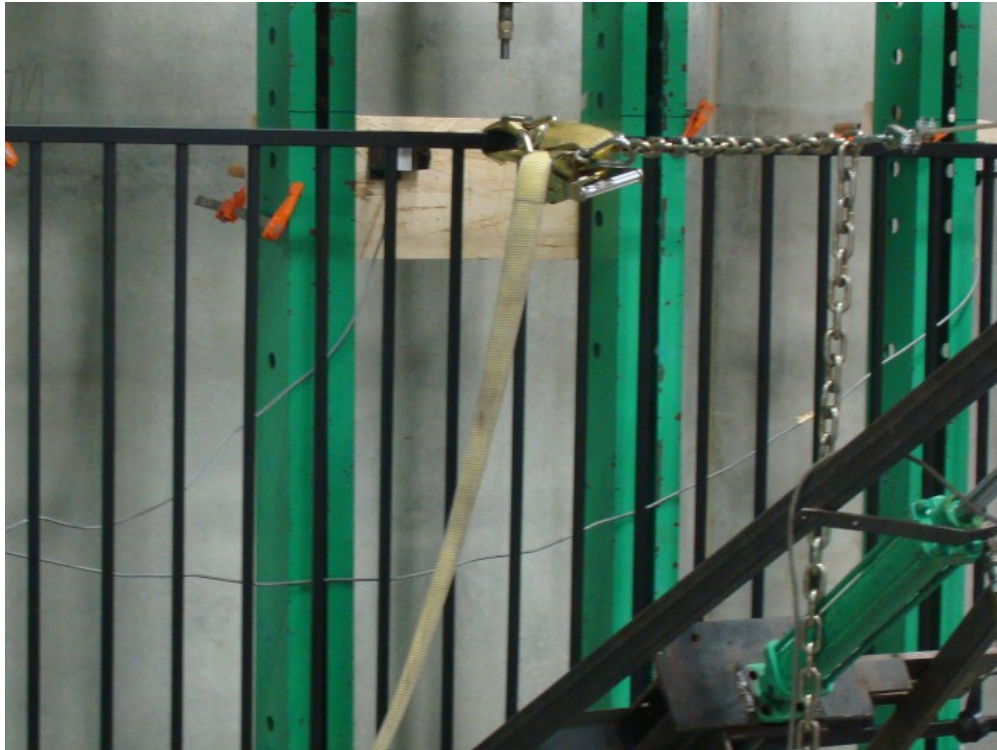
200 lbf Load Applied – Horizontal Midspan
